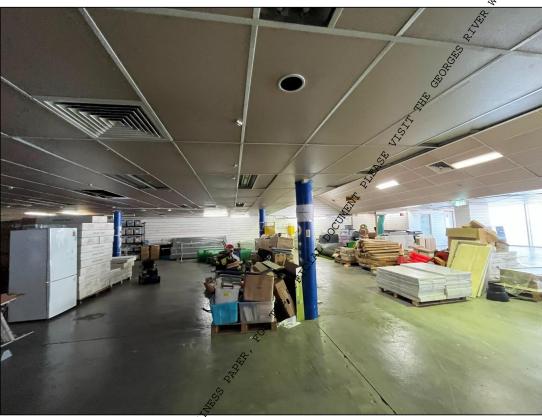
Existing ground floor of the site (Source: Assessing Officer)
